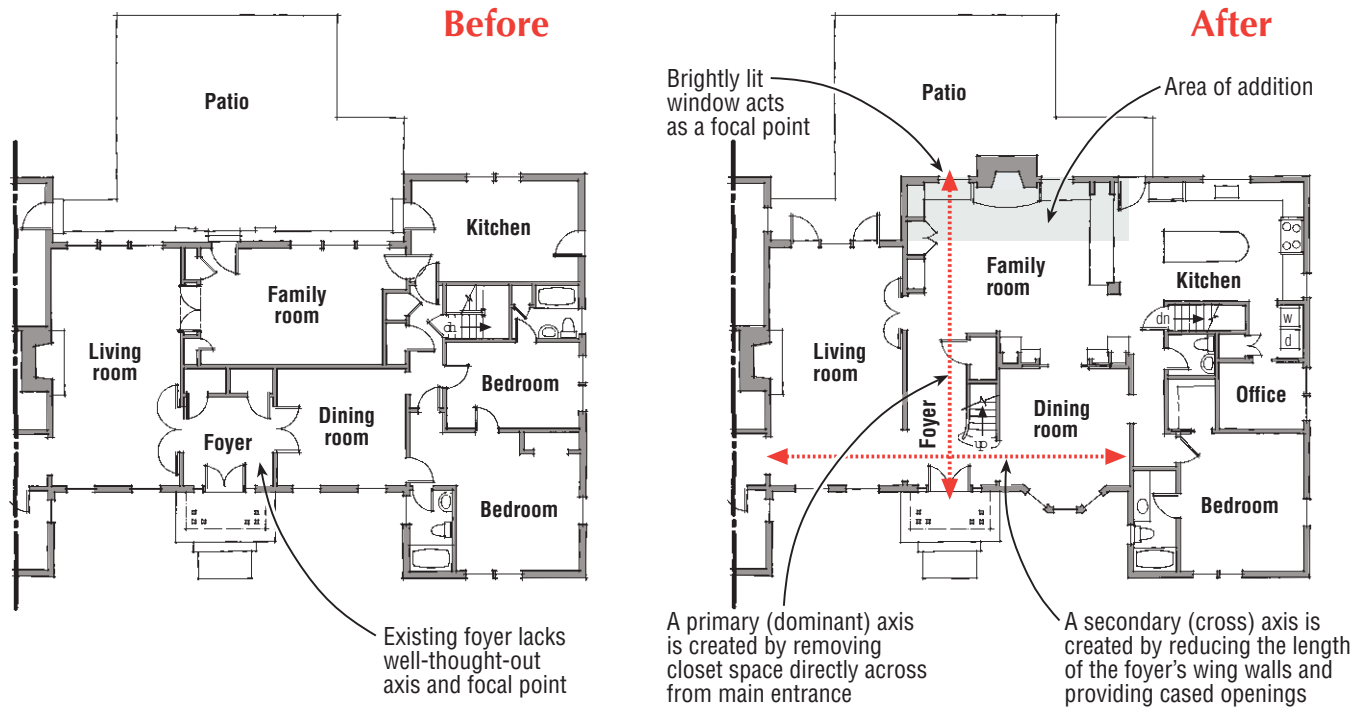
A major remodeling project can provide dramatically improved sight lines. In this revised floor plan, opening up the closet space to the left of the new stairs creates a primary axis from the front door to the window in the far wall of the family room. Aligning the doors in the walls at the sides of the foyer provides a cross axis connecting the living room, foyer, and dining room.
